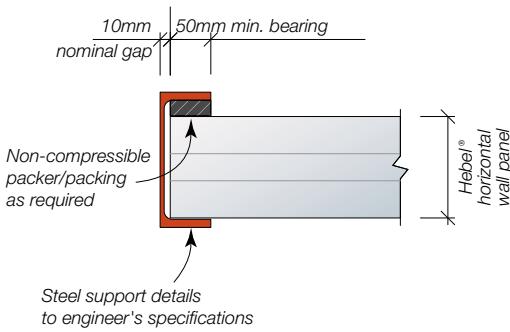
Horizontal wall panels control joint detail (plan).
